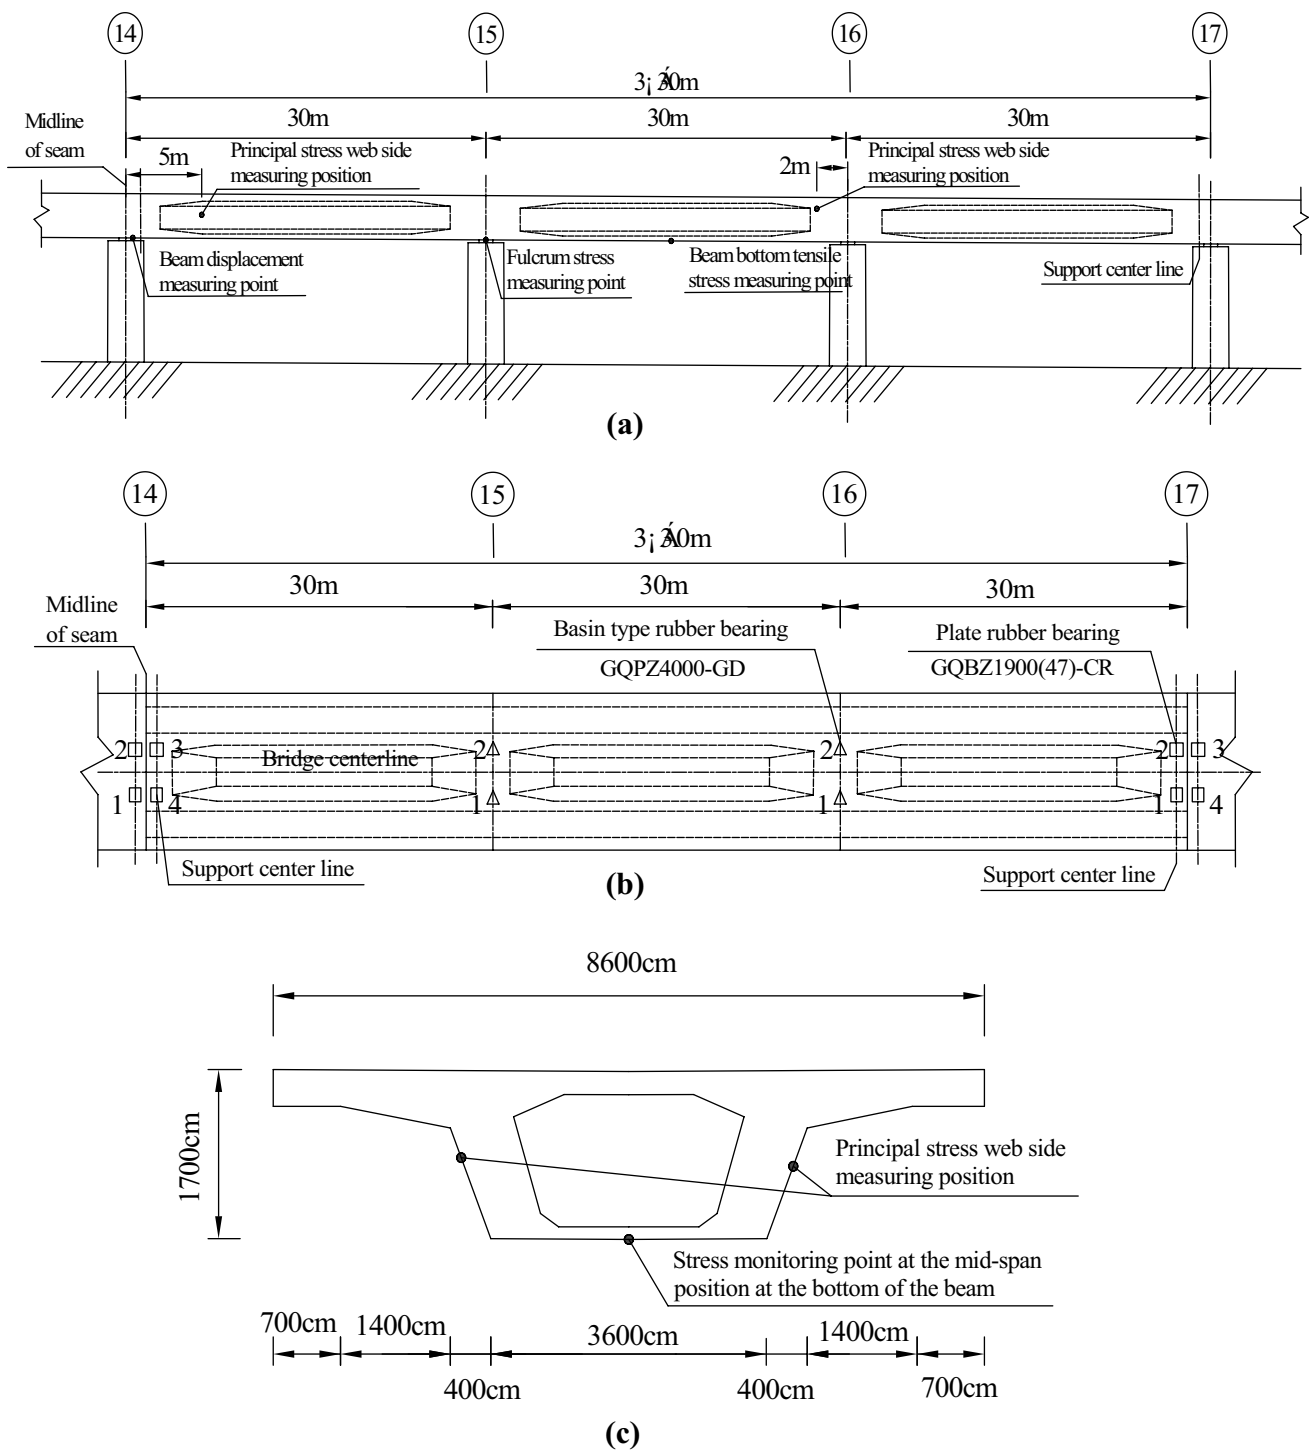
Layout of measuring points for 3×30 m prestressed concrete continuous beam bridge at piers 14–17: a schematic diagram of bridge elevation; b schematic diagram of the bridge; c cross-section of the beam
